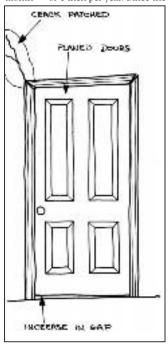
A failed foundation radiates reflected damage throughout the house - such as separated trim, gaps in the threshold and sticking door.
